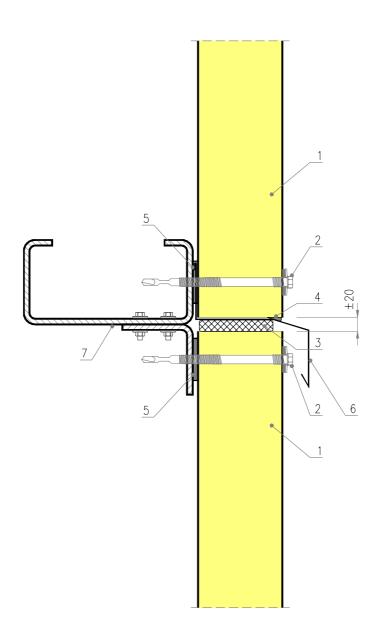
IzoWall PIR/PIR+; MWF; EPS - joining panels lengthwise, vertical configuration - high objects
